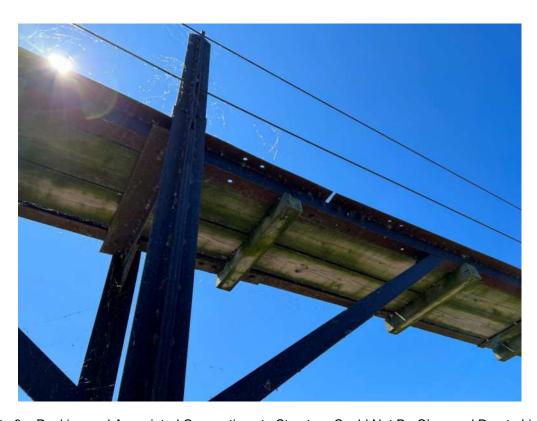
Decking and Associated Connections to Structure Could Not Be Observed Due to Limited Access
